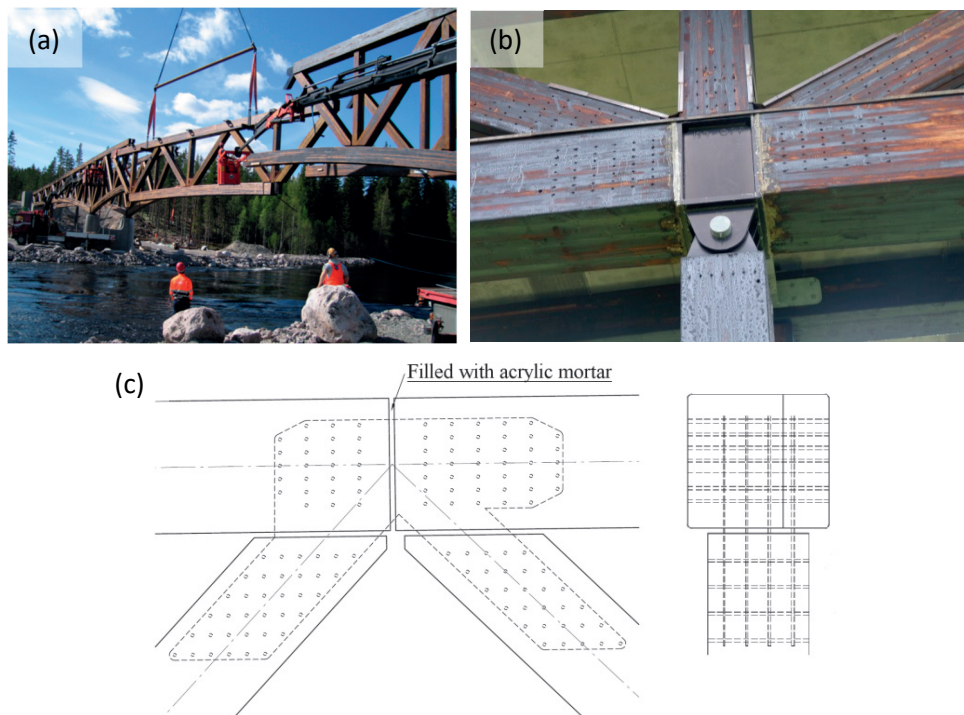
The Kjølssæter Bridge (2005), Norway: (a) truss structure under assembly, (b) detail of joint at the lower chord, (c) drawing of a connection at the top chord; source: (a) and (c) Moelven Limtre AS and Sweco AS
